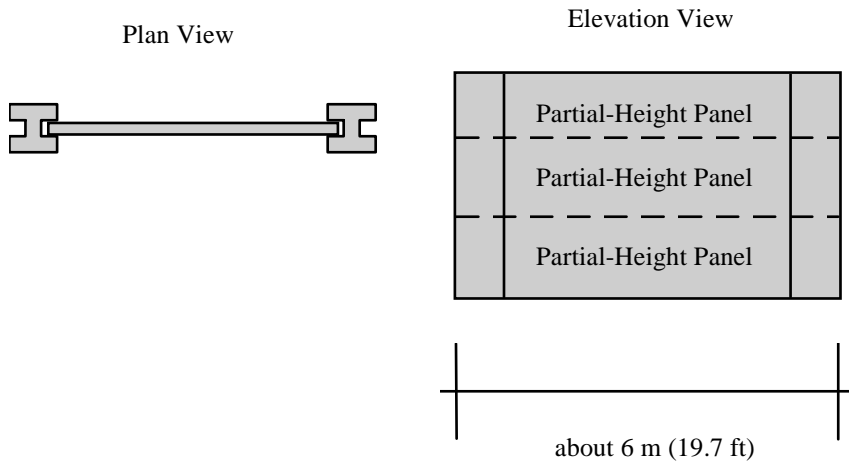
Schematic Illustration of Prefabricated, Separate Post-and-Panel System for Highway Sound Walls
